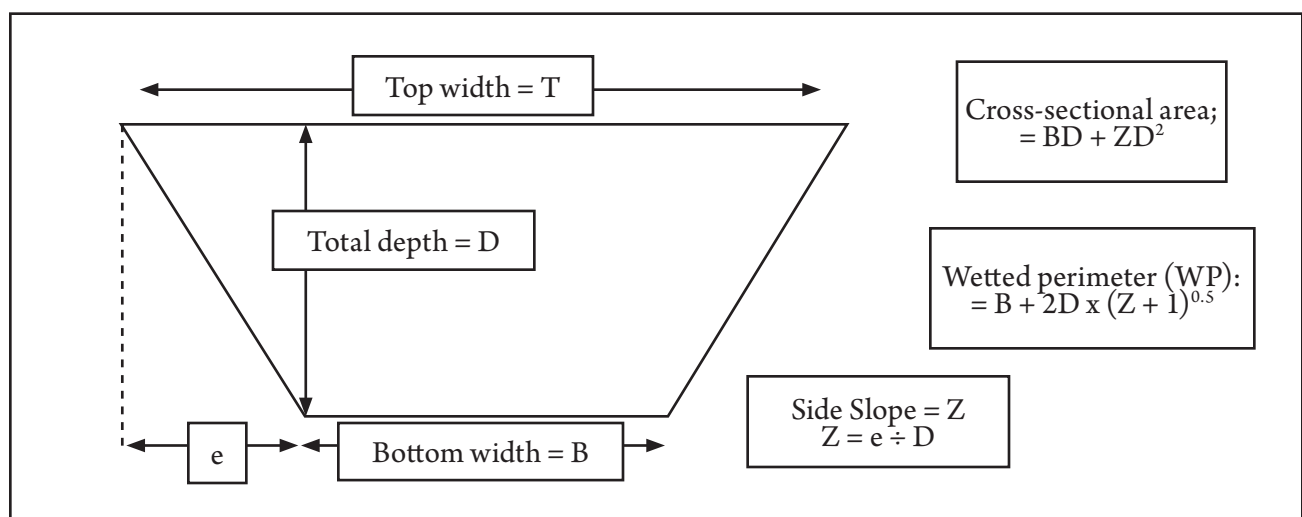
Trapezoidal cross section, basic dimensions and area equation.
